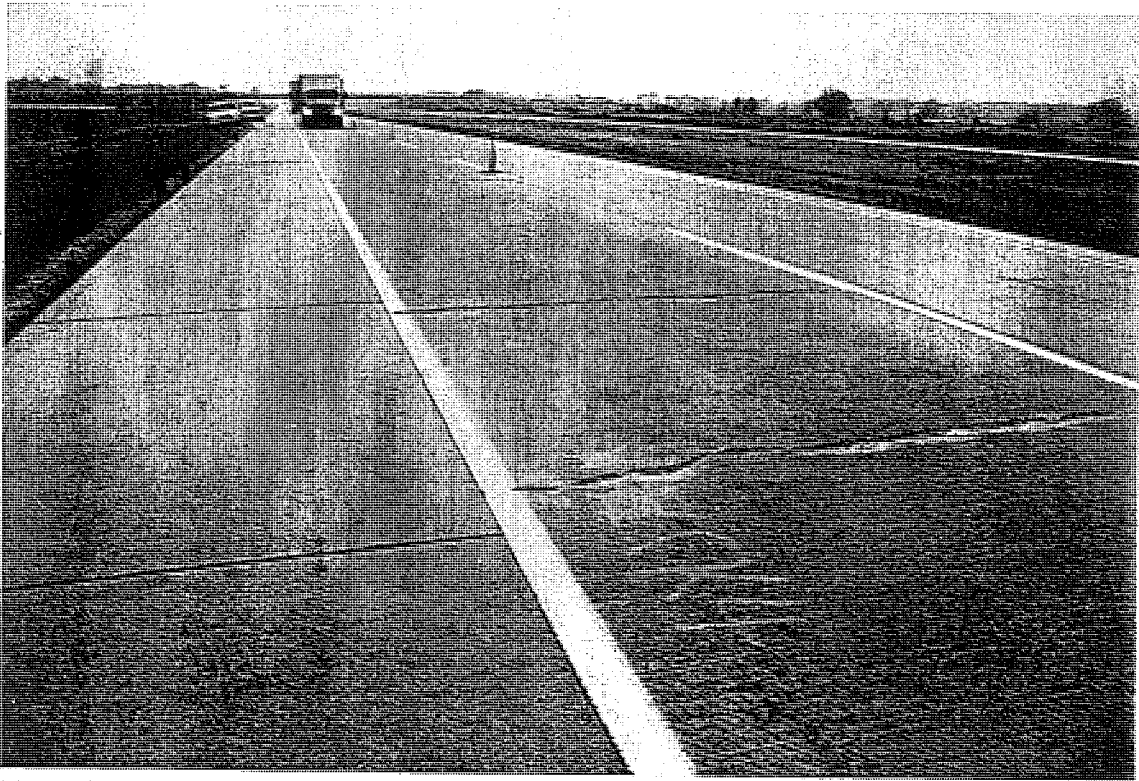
An overview of CSN# 77024-20821A (Section A), EB, showing severely spalled and faulted cracks at third point shoulder joints. The joint spacing in the driving lanes is 41 ft.
